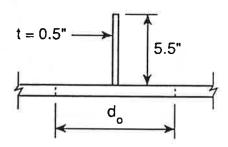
Effective Width of Web Plate, do, Acting with Transverse Stiffener
